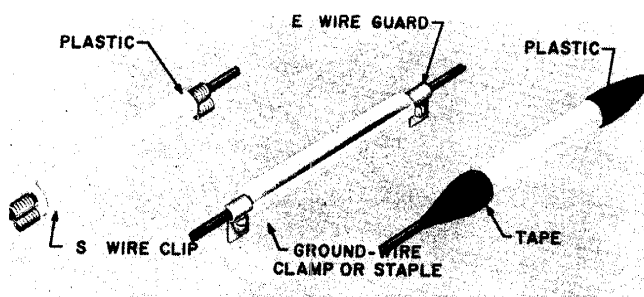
Securing Plastic Tubes or E Wire Guard
